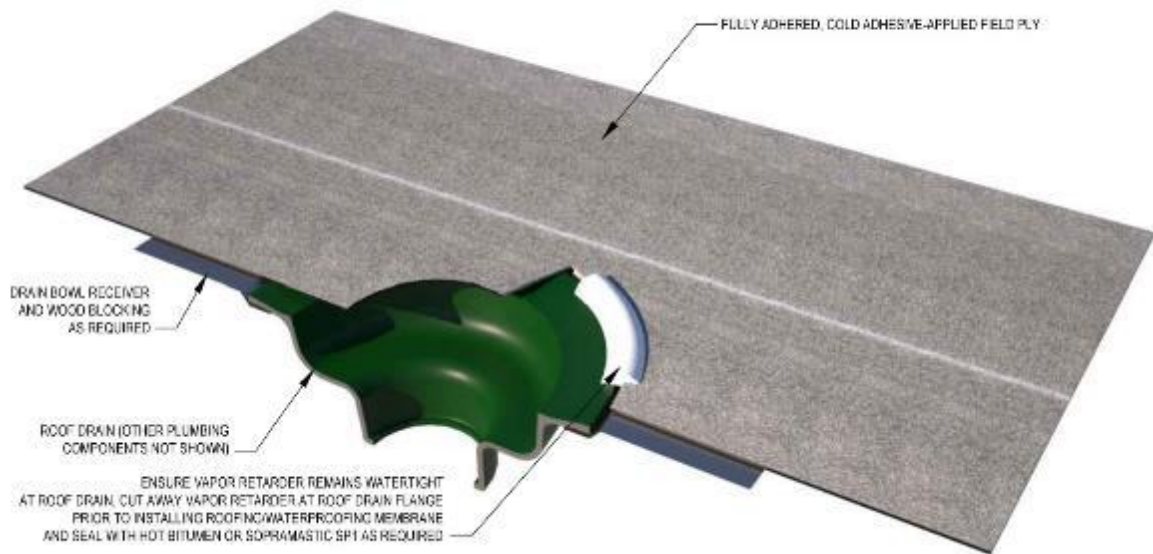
Fully Adhered, Cold Adhesive-Applied Vapor Retarder at Roof Drain
